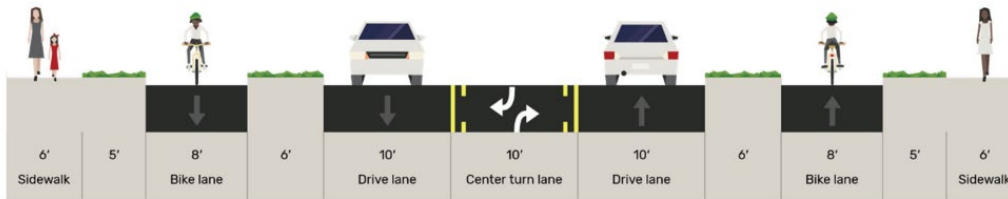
Section B (13th – 17th) – Proposed (58' curb to curb)
